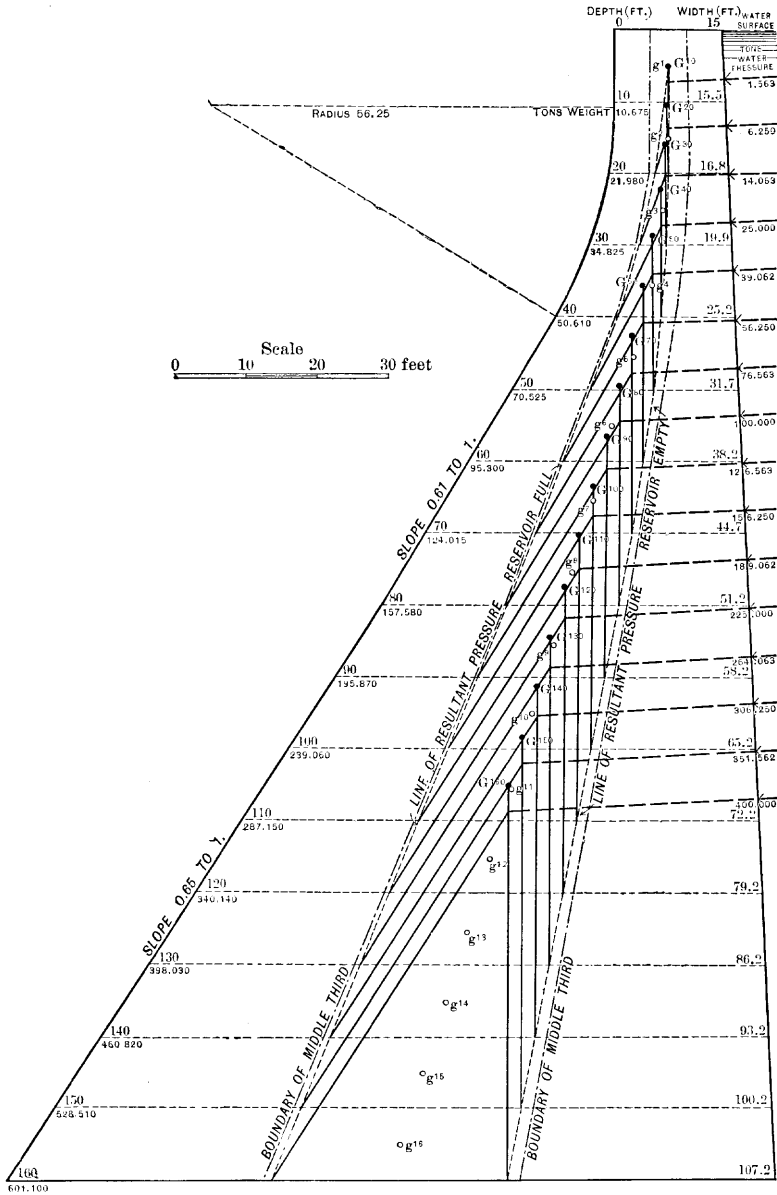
Section of masonry dam based on masonry weighing 140 pounds per cubic foot.
